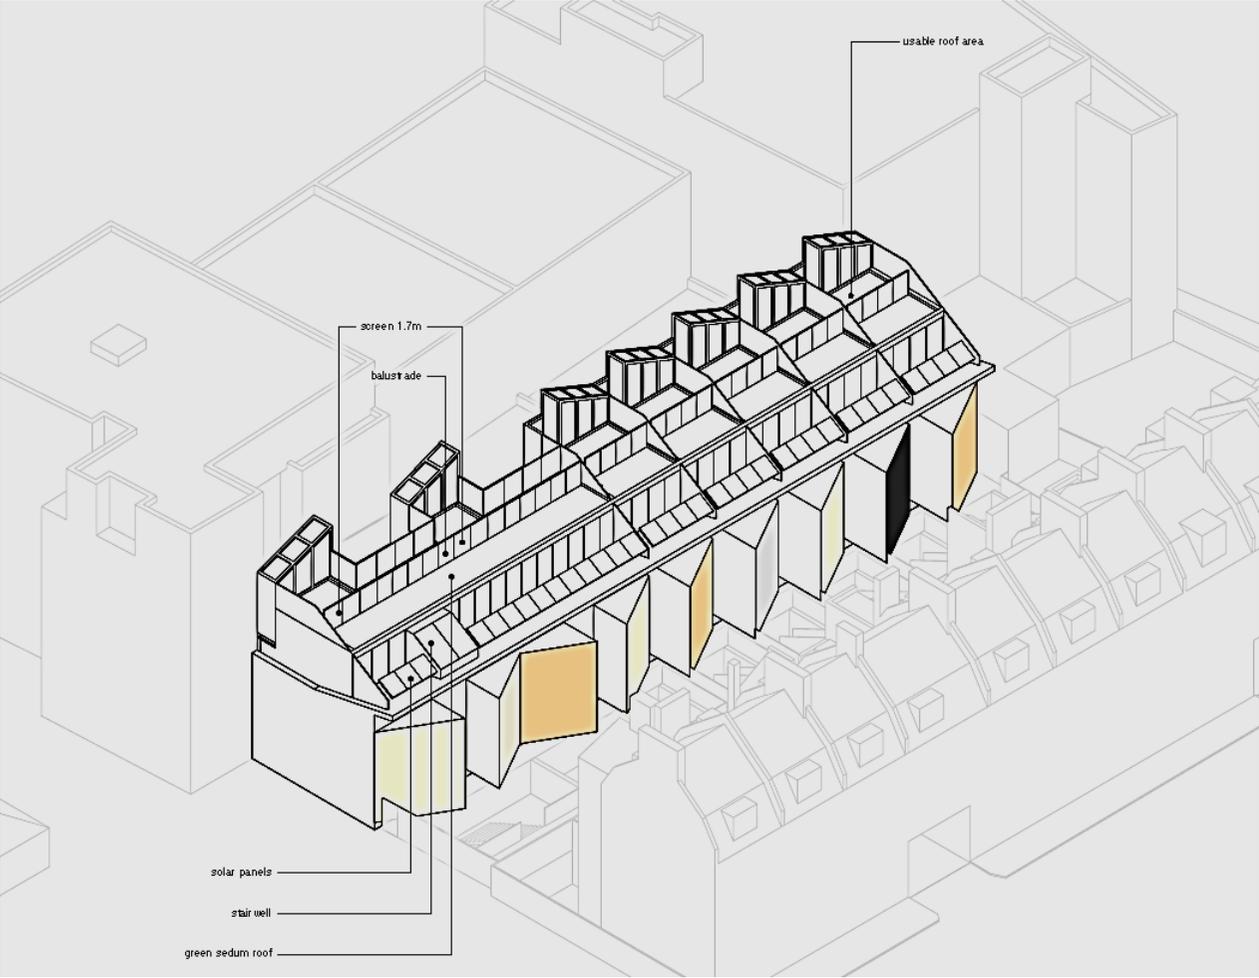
04.68.230 - Proposed Study of Overlooking to Neighbours on Settles Street
